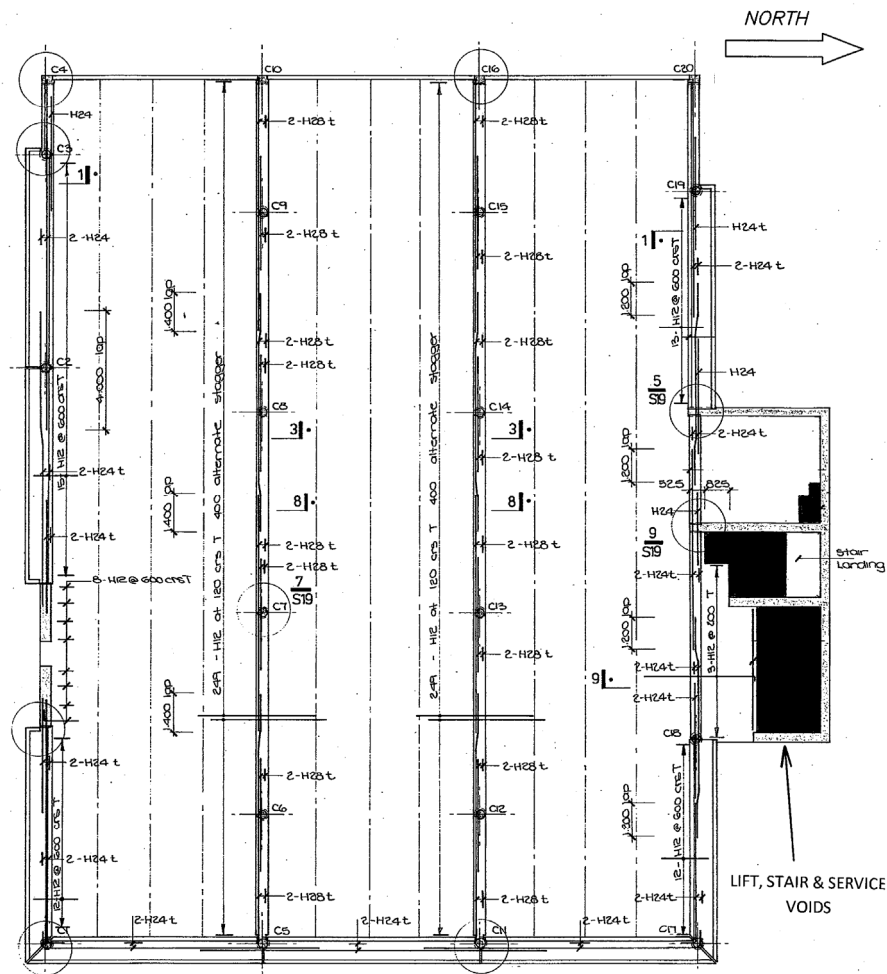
Typical Floor Plan of the CTV Building, Christchurch
